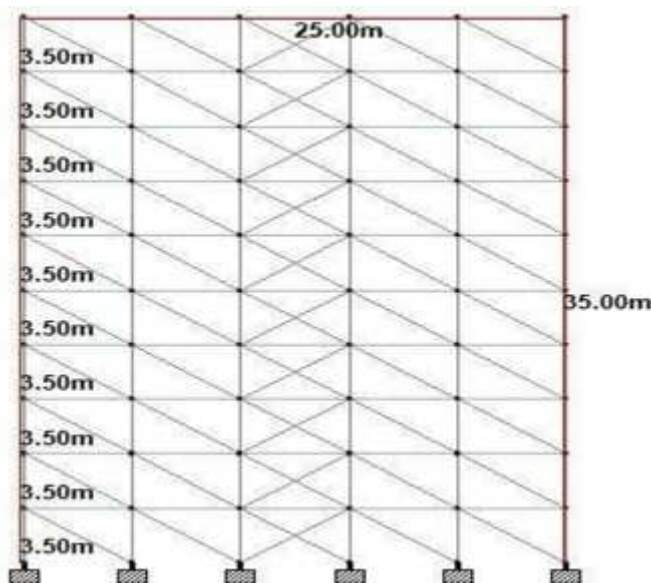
Elevation of flat slab building having 80 % infill walls
